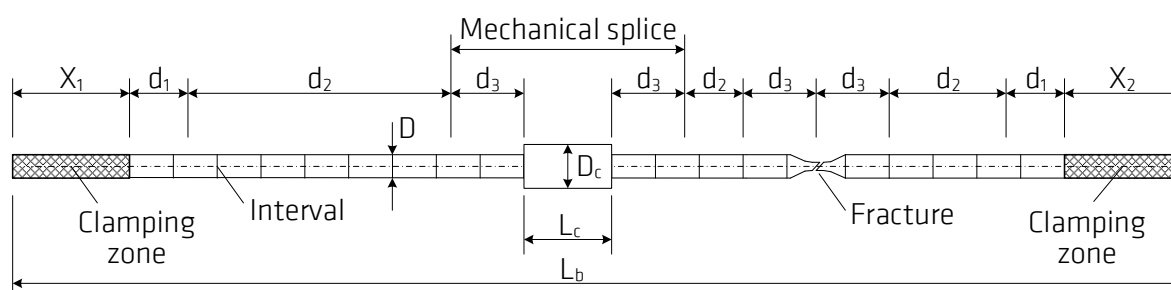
Geometry of specimen with coupler after testing with definition of dimensions and distances
